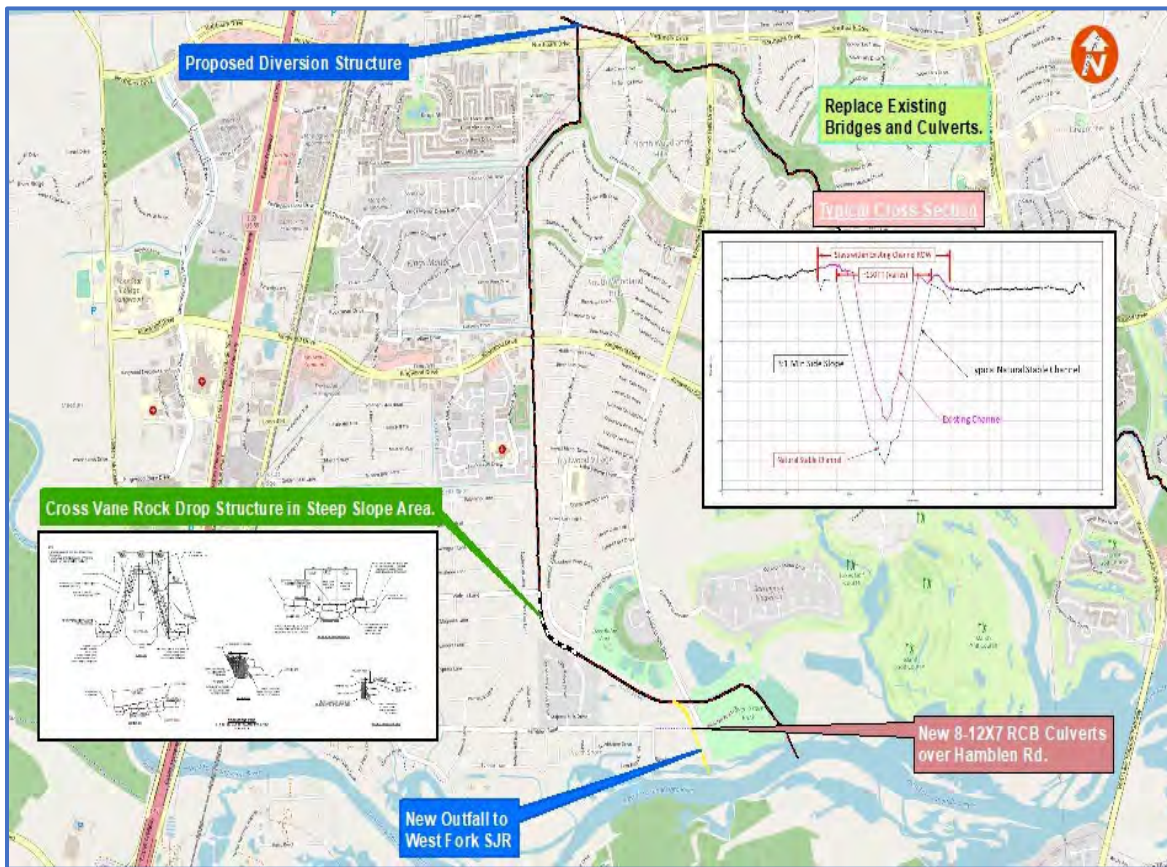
Alternative 3 - Natural Stable Channel Section Design
